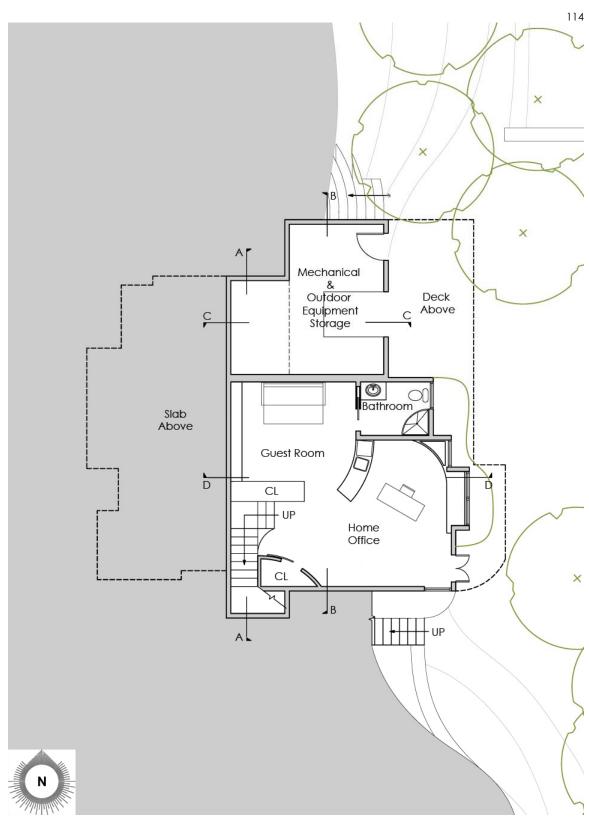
Lower Floor Plan - 3/32" = 1'-0"
